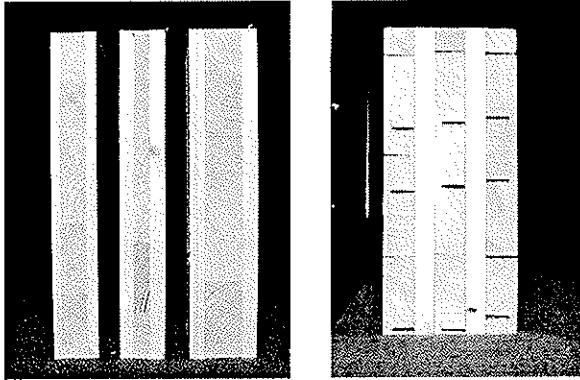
Cross-sections of panels without and with gaps between boards and grooves
